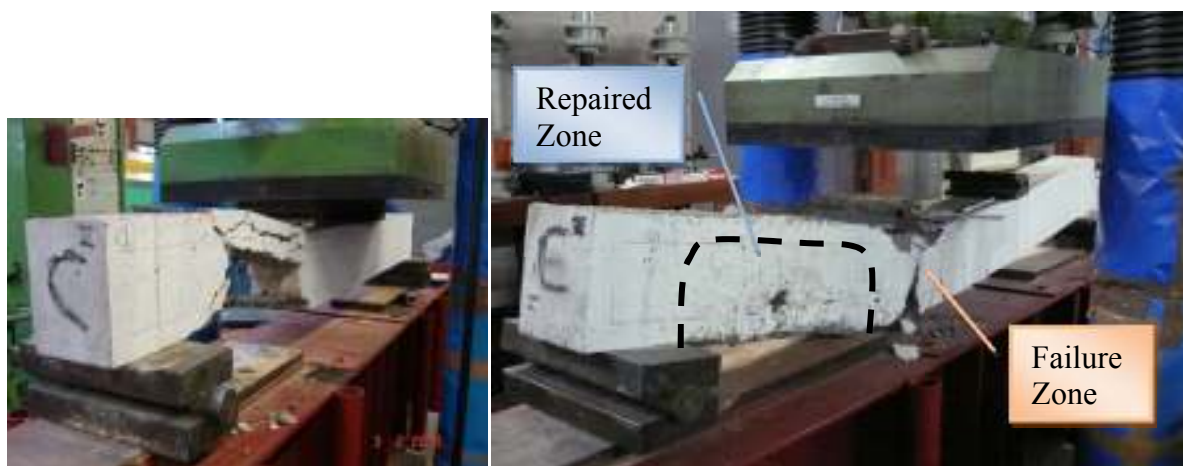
Bending test of damaged beam (left); and beam repaired with CSA shotcrete material (right).
